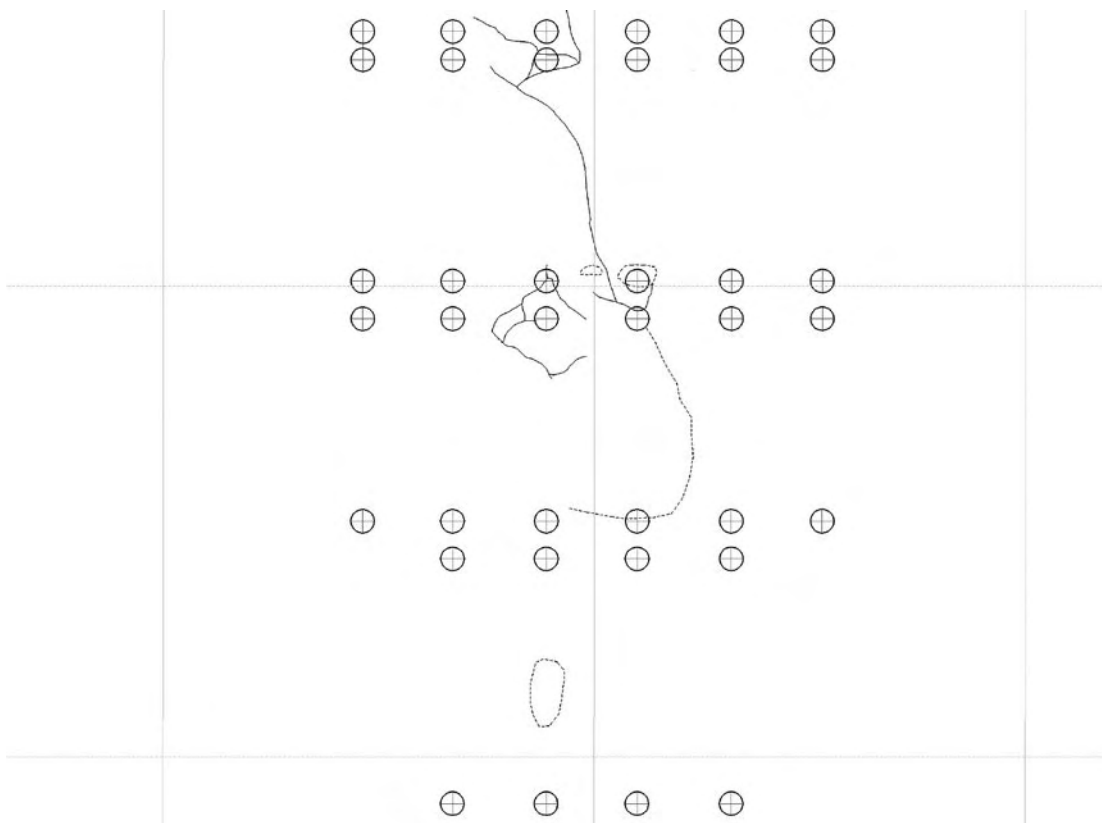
Detailed spalling observations on June 16. At 3 m depth a small rock fragment had fallen of at the very pillar centre (dashed oval).
